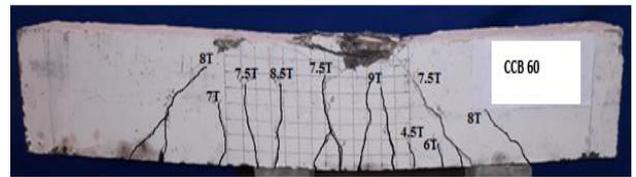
Failure Pattern of Concrete Beam M 60 (CCB)
